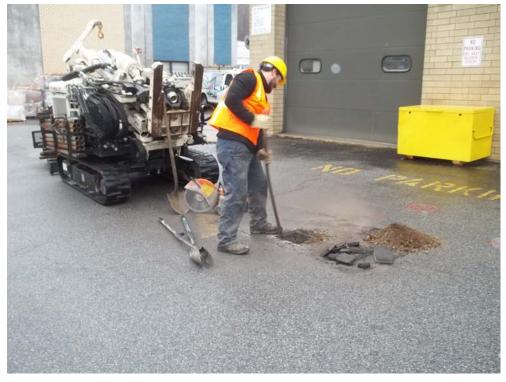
Drywell piped to area of former oil-water separator/drainage system in maintenance bay.
